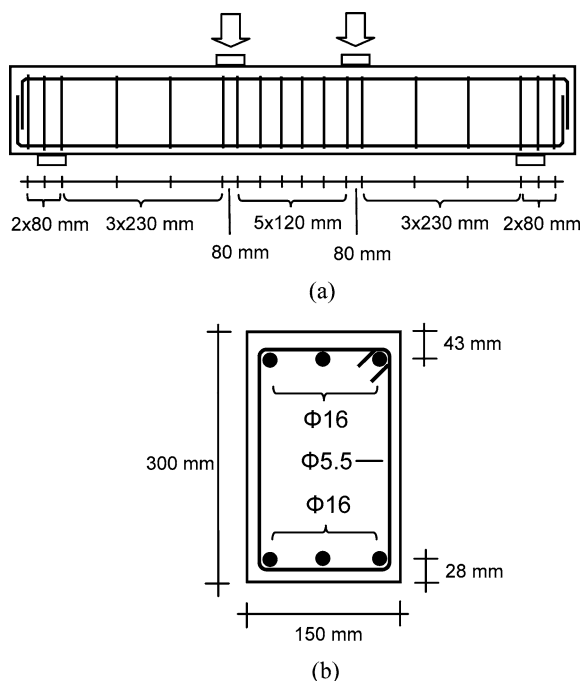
Details of the reinforcement in the beams tested: (a) spacing of stirrups, (b) cross section.
